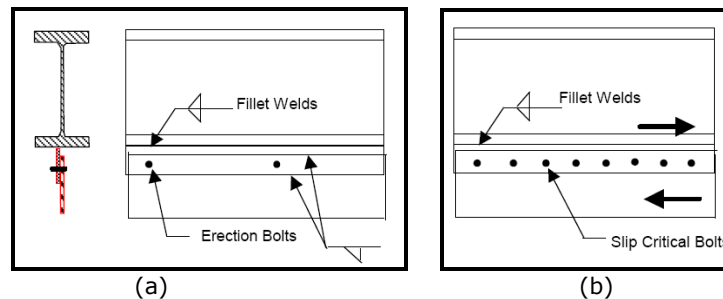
Connection of the steel plate shear wall to boundary beams and columns: a) Welded connection; b) Bolted connection
